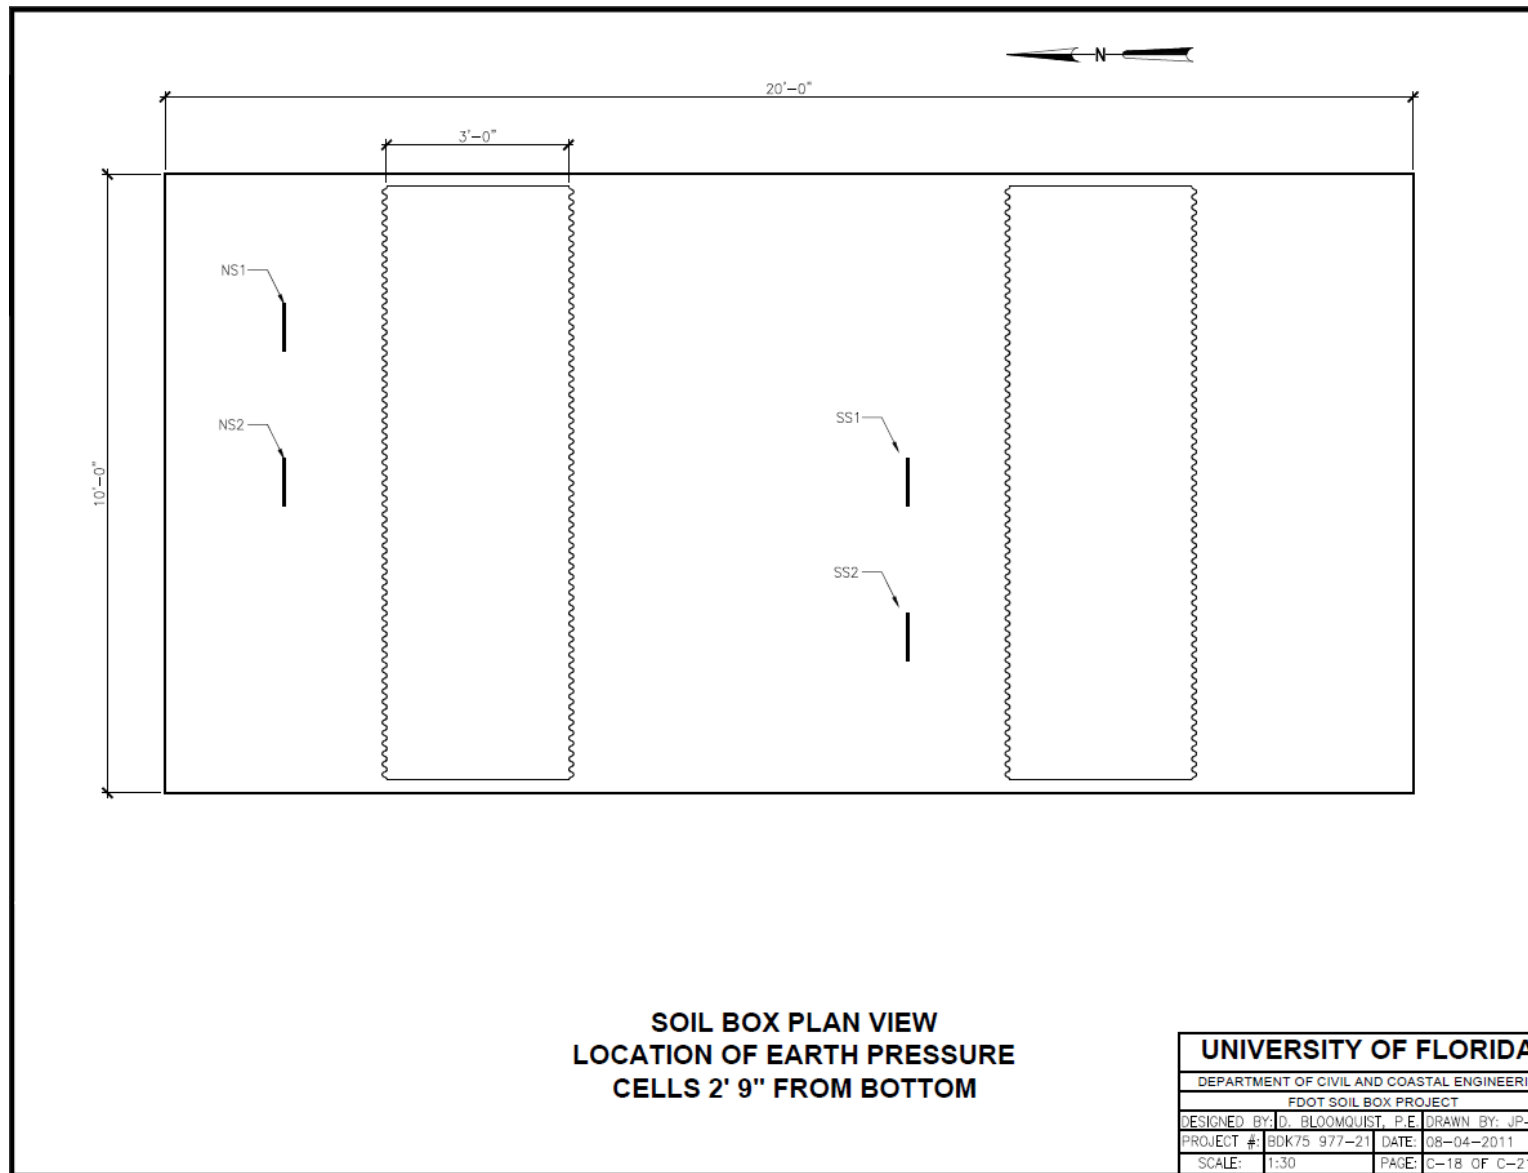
Earth pressure cell layout for steel pipe test 2'-9" from bottom of Soil Box.
